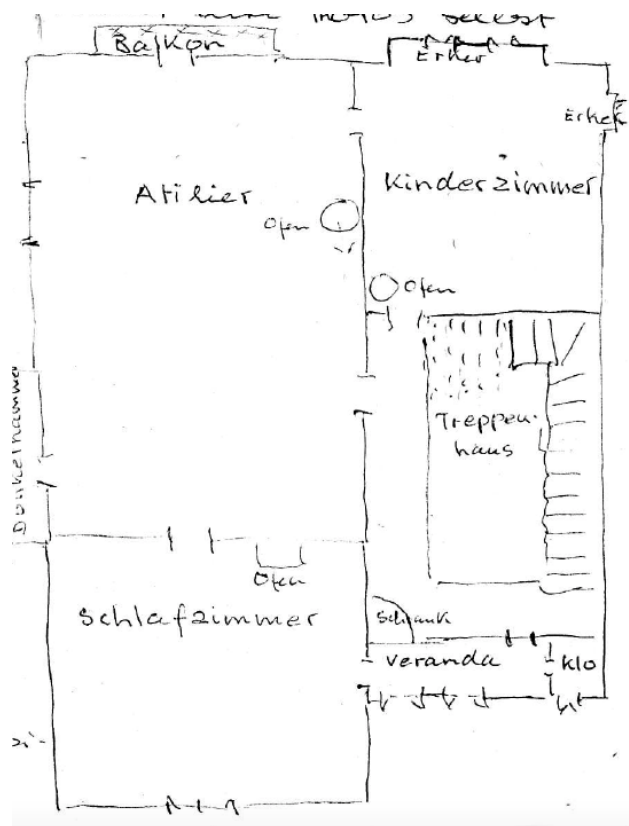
Ruth's sketched floor plan of one floor of her childhood home in Dachau, 1989, Tim Locke's blog.
